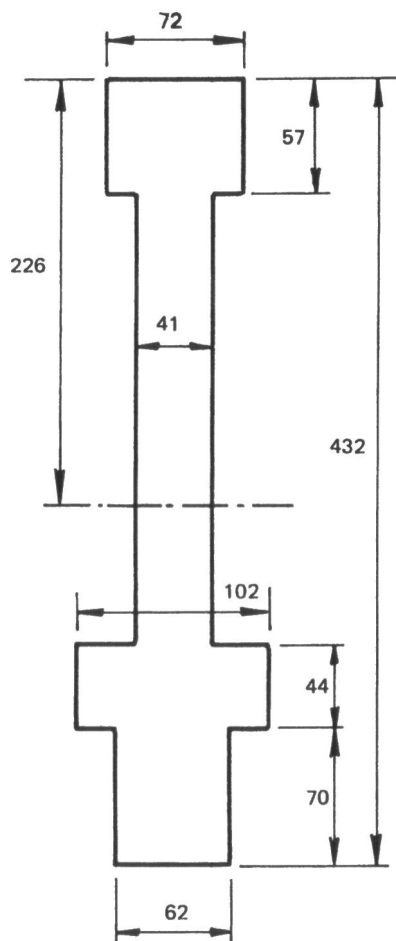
Cross-section of rib of Magdalene Bridge, Cambridge.
